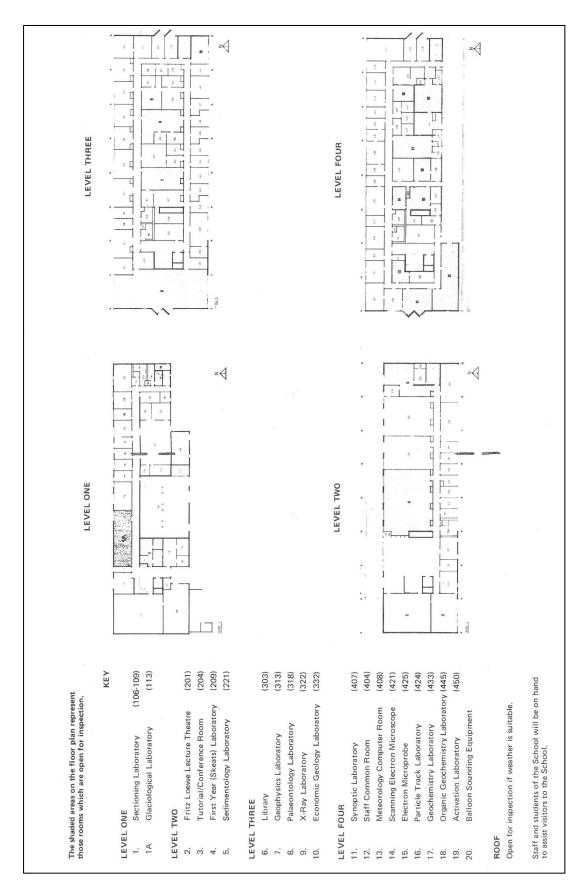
Floor plan of the subject building's interior plans and layout, 1977
